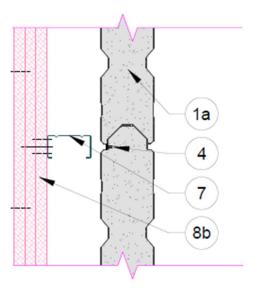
Plan view of 78 mm Speedpanel with 3  $\times$  16 mm fire rated plasterboard cladded steel frame on one side – option 9
